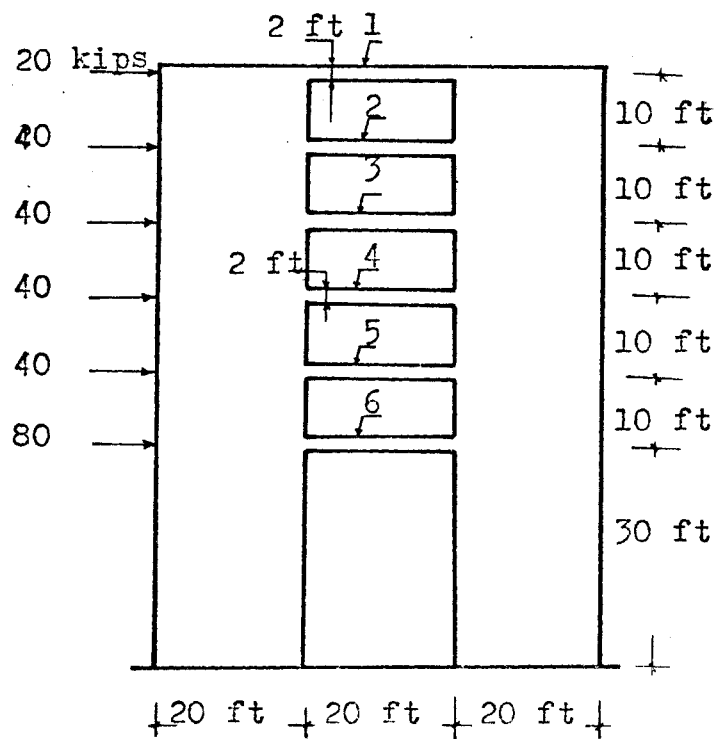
MODEL SHEAR WALL PROBLEM
